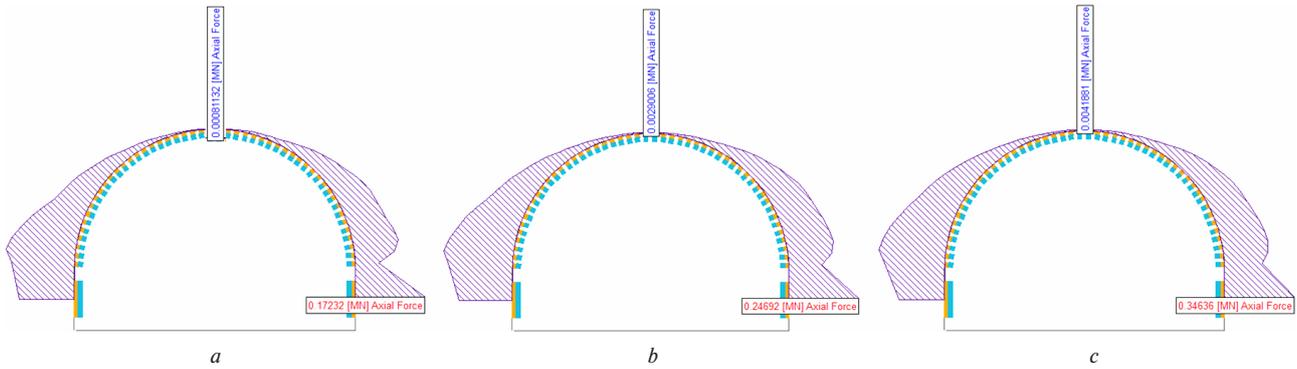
Axial forces in the elements of steel arch made of SVP27:
